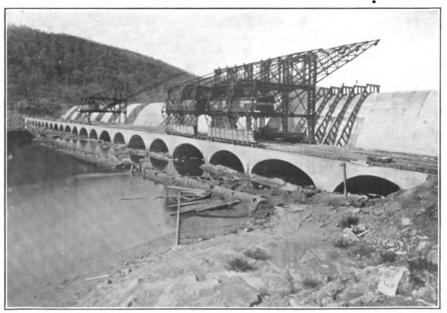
Fig. D.—McCalls Ferry dam, showing concrete construction bridge and cantilever cranes.
